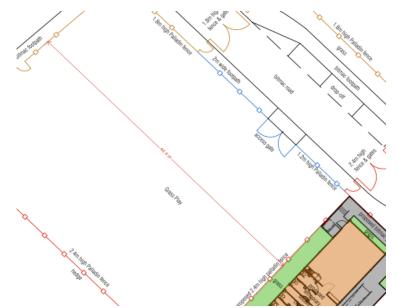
Plan indicating separation distance of proposed unit from the main road (44.4m separation distance)
